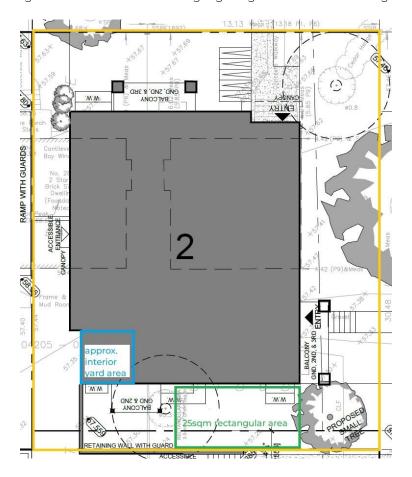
Coloured Site Plan Highlighting Variances for Building 2
